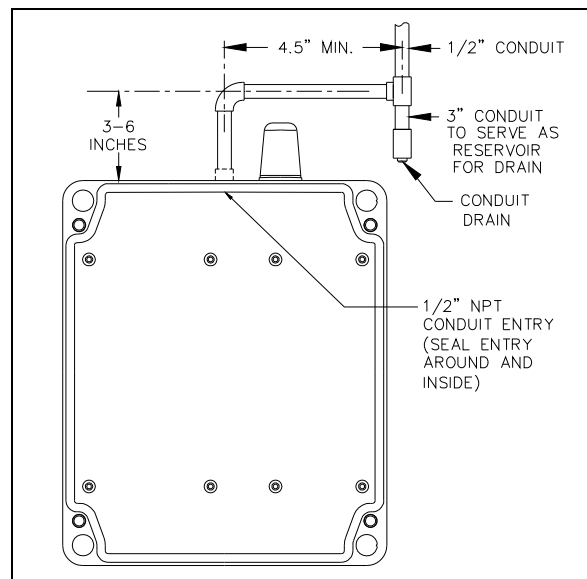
Top entry conduit installation details for metallic enclosures (NOT recommended)
